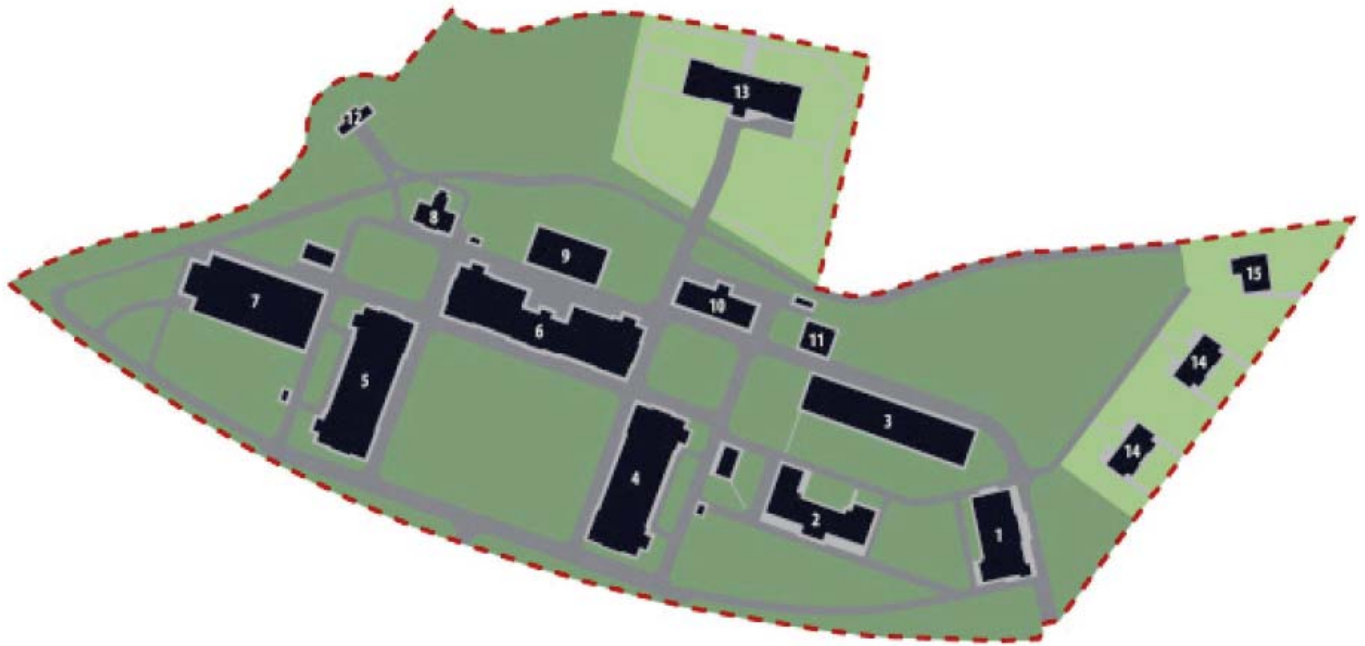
Plan of the original compound. Functions per buildings: 1 guard building, 2 the officer's mess, 3 garage, 4 pavilion I, 5 pavilion II, 6 main building, 7 training building, 8 bath house, 9 gymnastic building, 10 mess hall, 11 stables, 12 armoury, 13 hospital, 14 houses, 15 the building of the army engineers.
